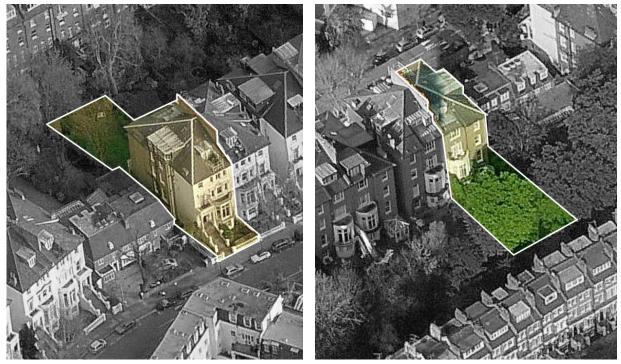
Birds eye views of 62 Belsize Park Gardens, South West & North East 1. Introduction
